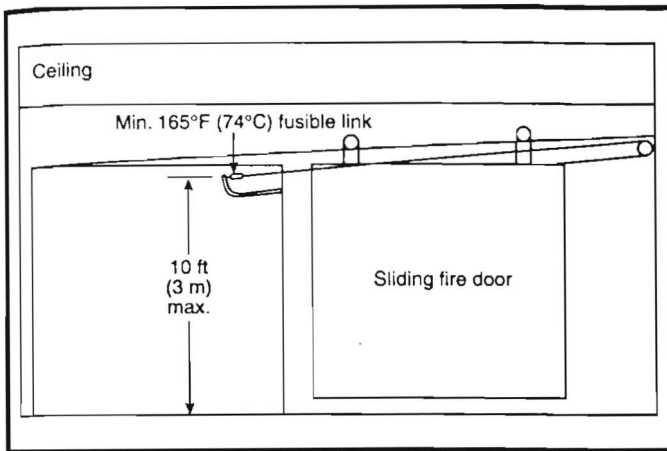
Existing horizontal sliding fire door in accordance with 28-2.2.2.4. By requiring the fusible link to be positioned in immediate proximity to the door opening, rated 165°F (74°C) or higher, and located not more than 10 ft (3 m) above the floor, the door should remain open until rising temperatures make it unsafe to pass through the door opening.
